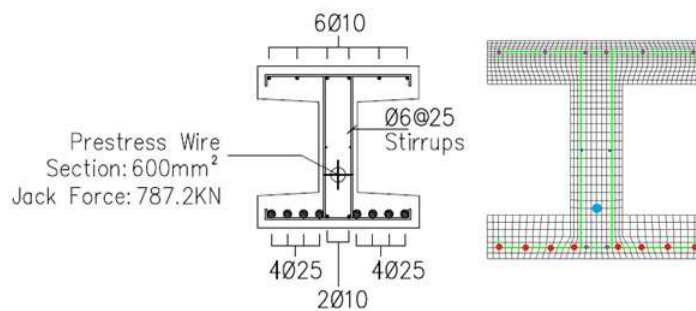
Reinforcement detail of the analyzed cross section - FE mesh
